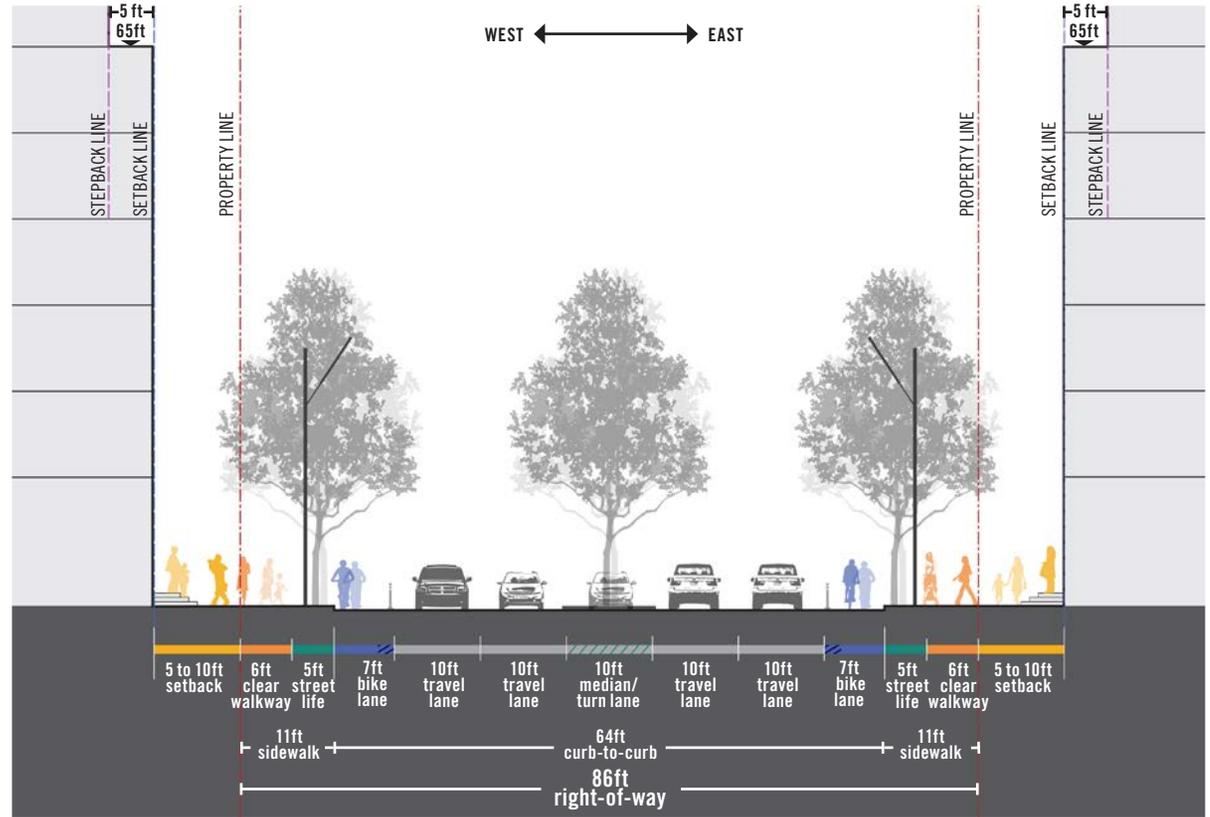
Lick Mill Boulevard Street Section: North of Calle De Luna
